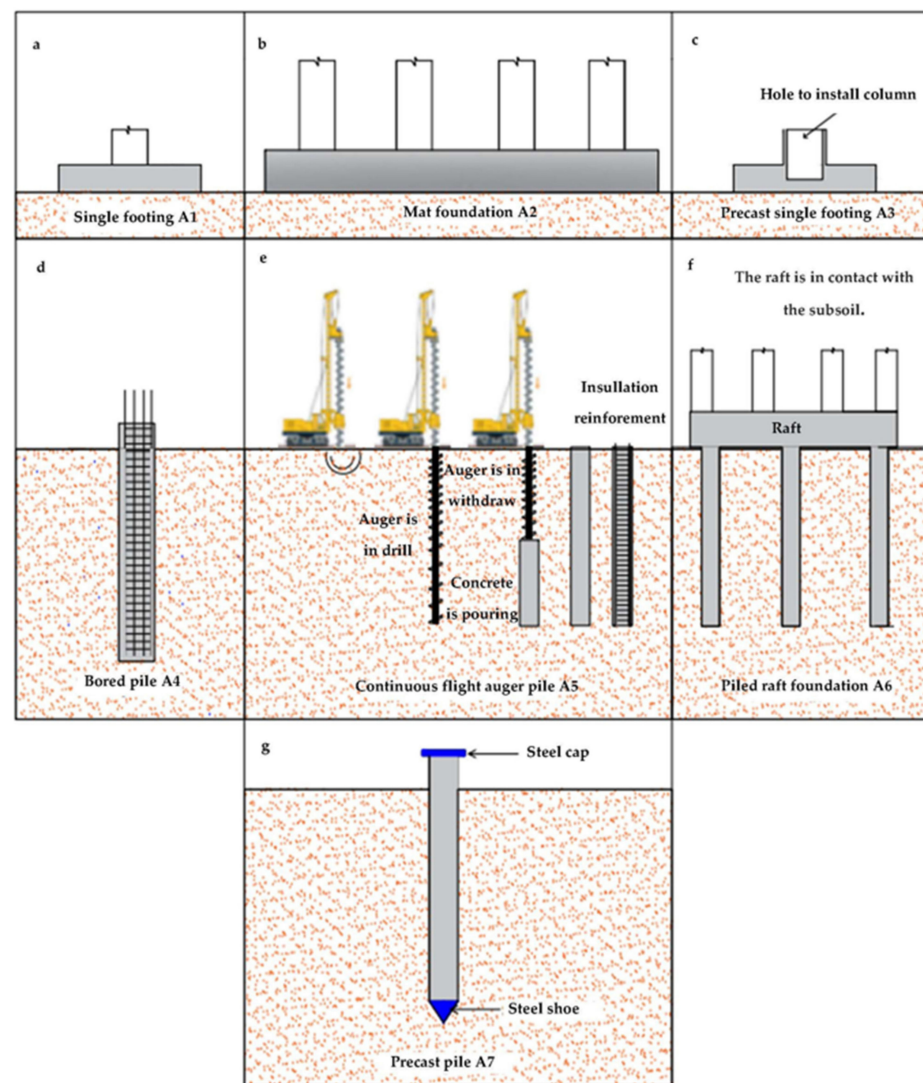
The seven foundation alternatives (a) single footing A1; (b) mat foundation A2; (c) precast single footing A3; (d) bored pile A4; (e) continuous flight auger pile A5; (f) piled raft foundation A6; (g) precast pile A7.
